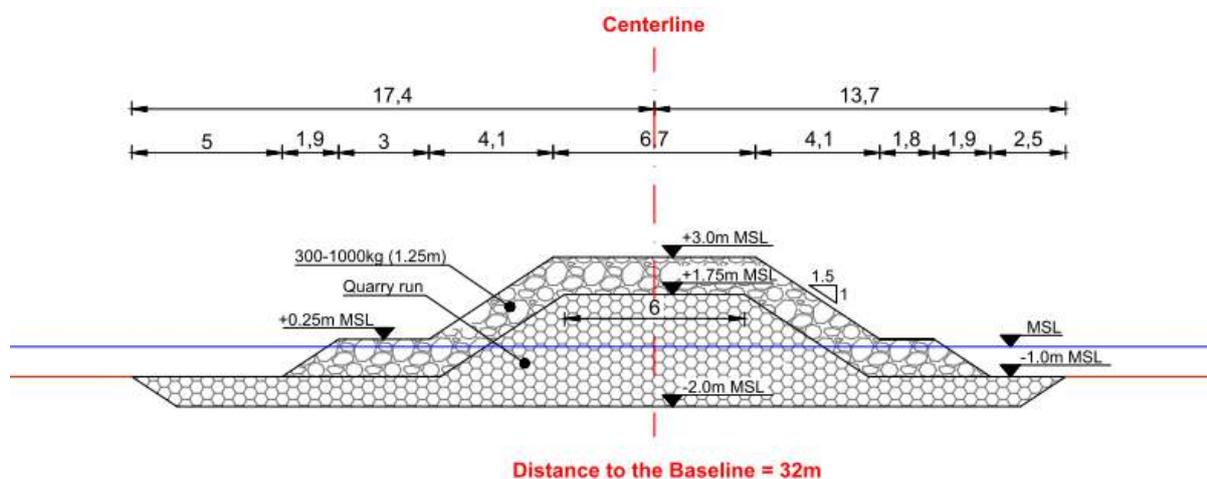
Principle cross-section West Point - groyne trunk B-B (Alternative B)
